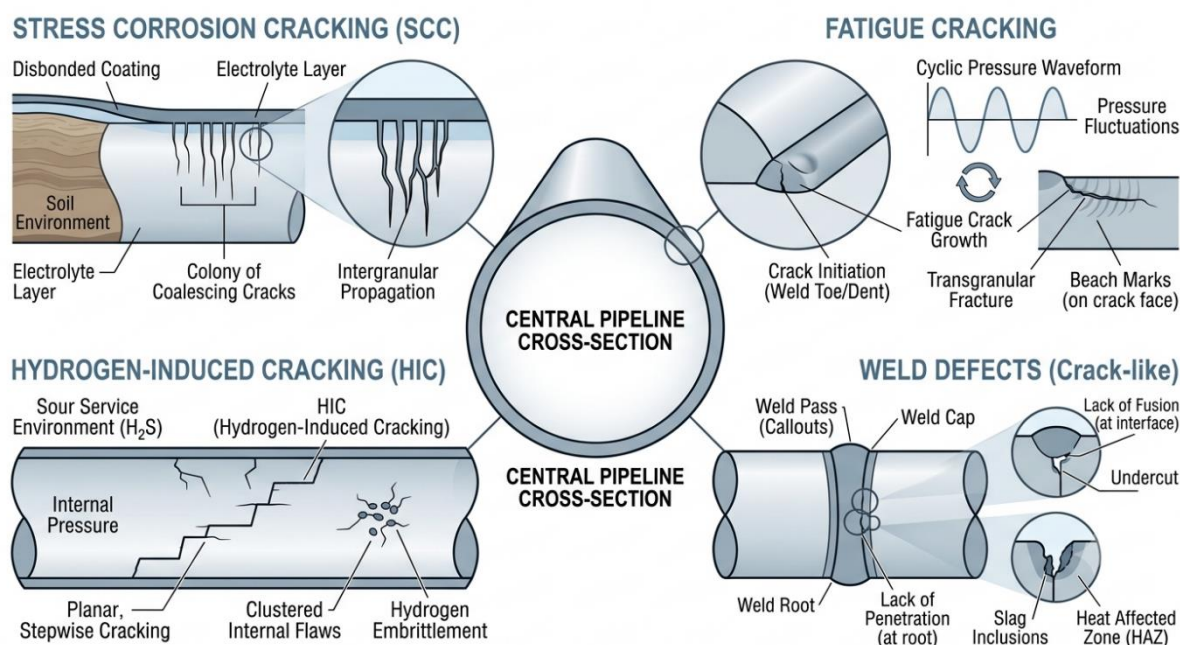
Crack-Like Pipeline Defects: SCC, Fatigue Cracking, HIC, and Weld Defects
